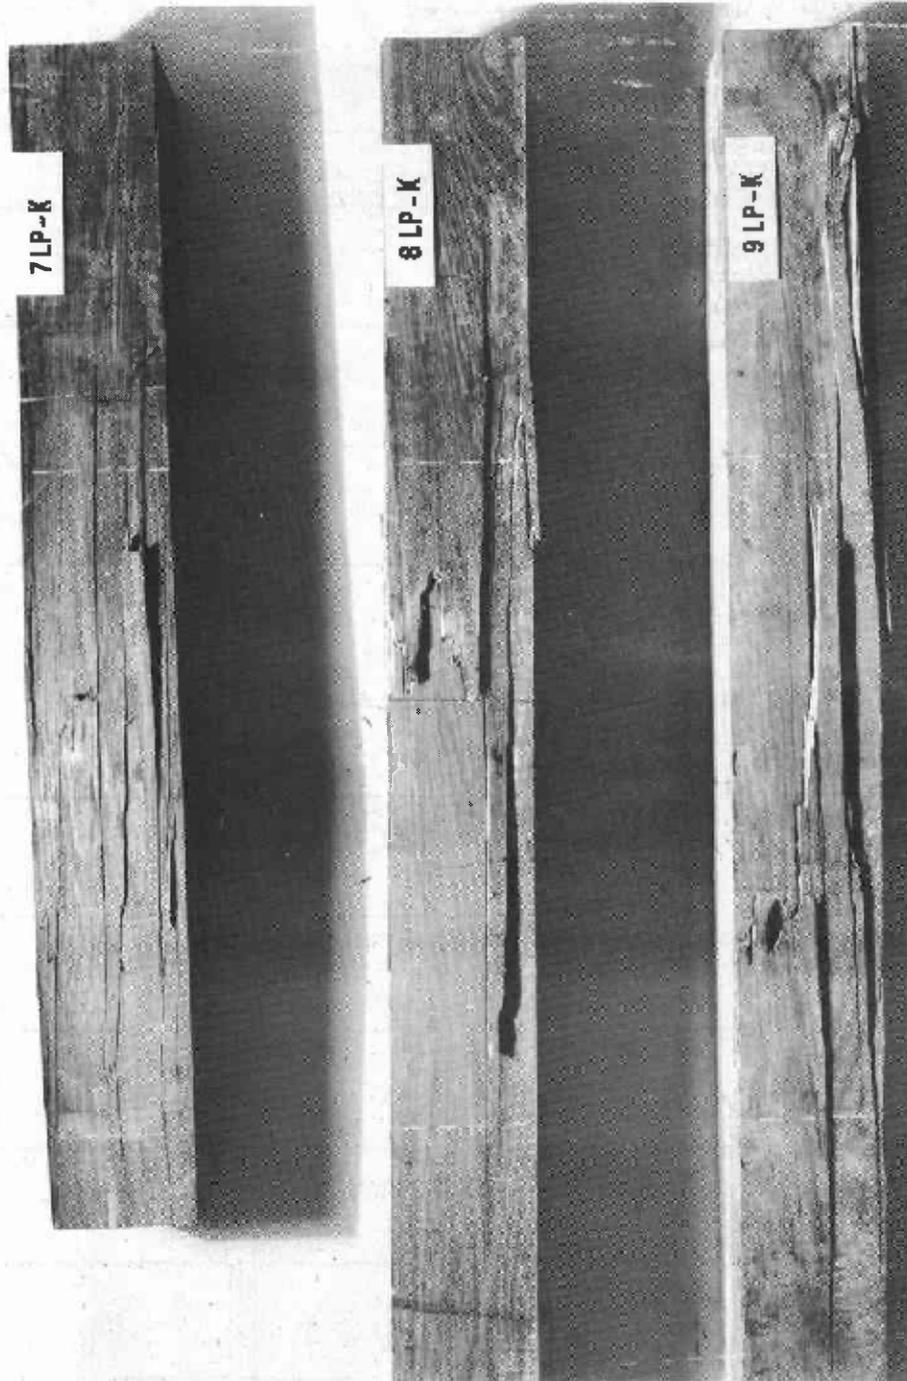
Bottom view of typical failures of laminated keel sections with plain scarf joints of slope of 1 in 12.
